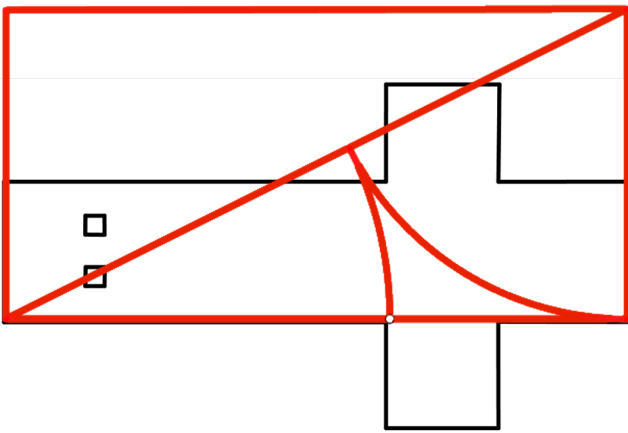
Geometric construction to verify golden ratio in Pan-ay Church floorplan.
